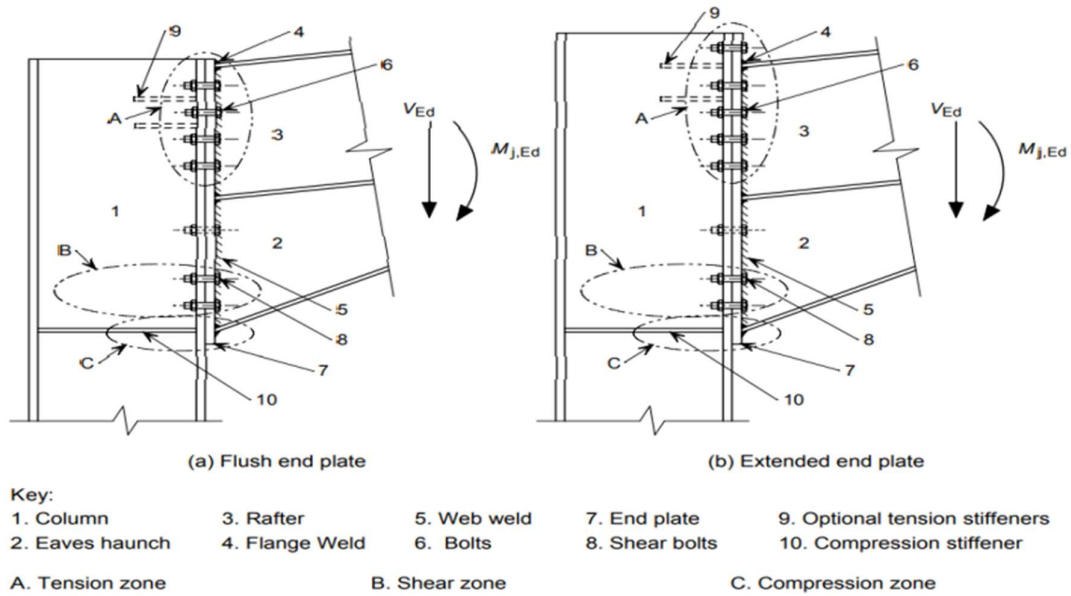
Portal frame eaves connection with bolted end plate (NCCI, 2008)
